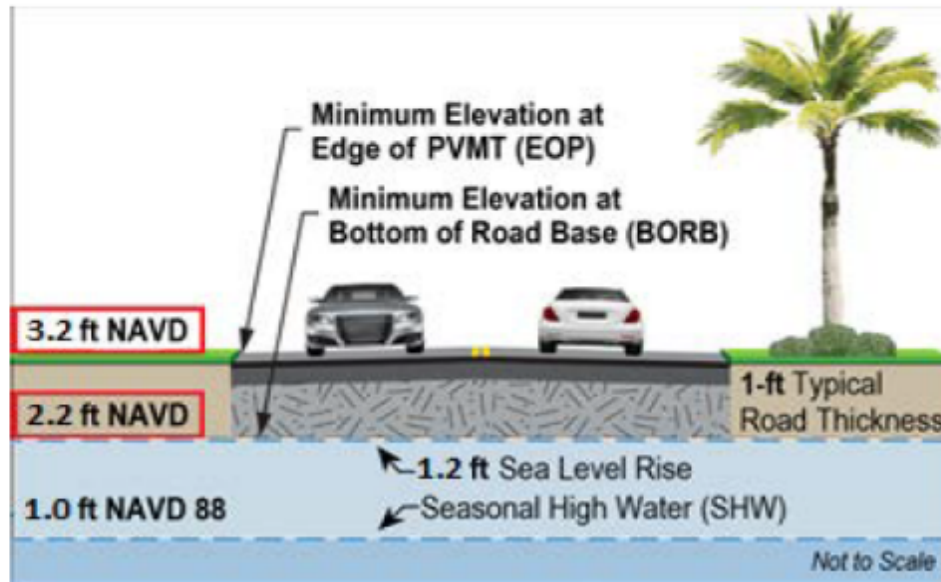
Minimum Elevation of 2.2 ft NAVD 88 for the Bottom of Road Base for All Roads
